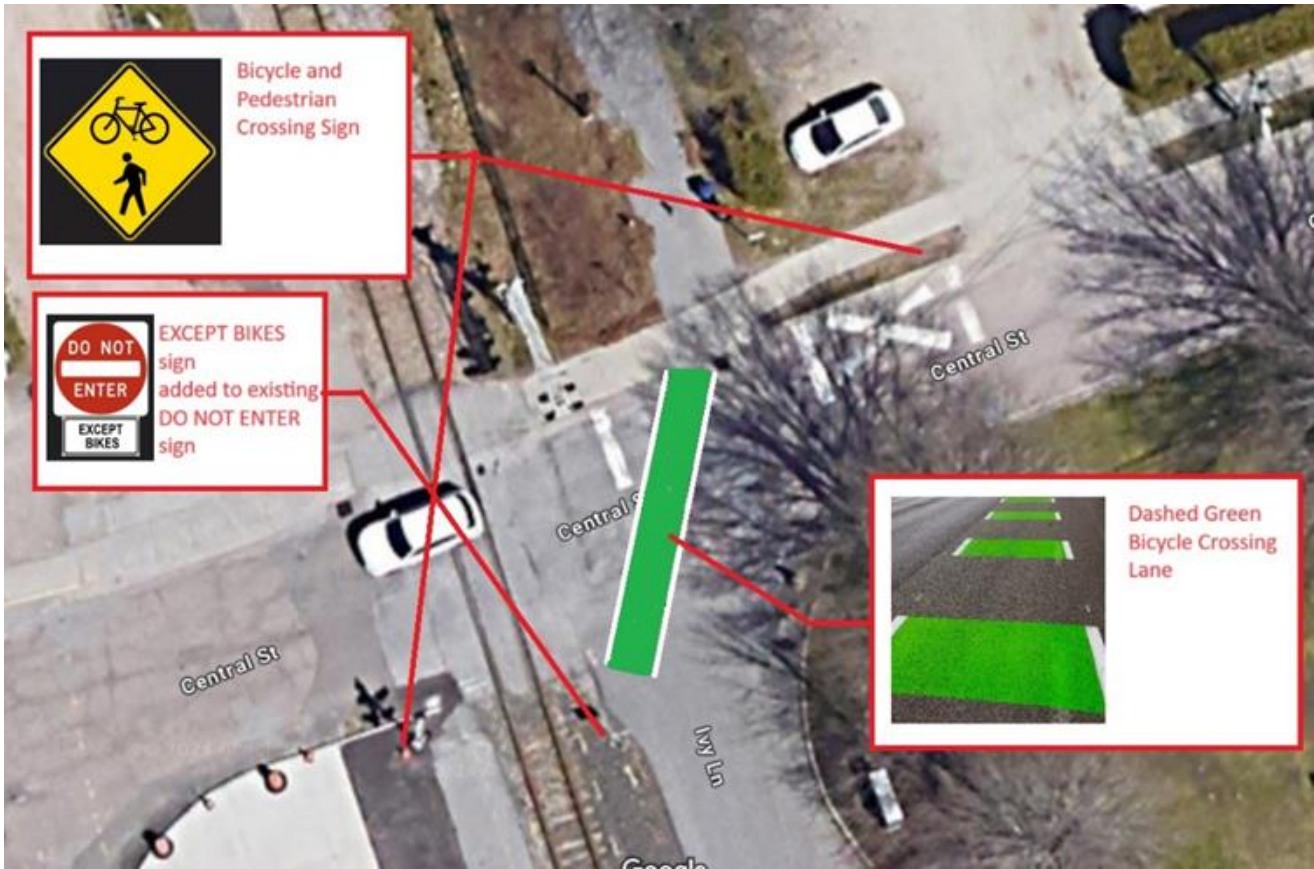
Alternative 4 – Ivy Lane/Central Street Crossing
